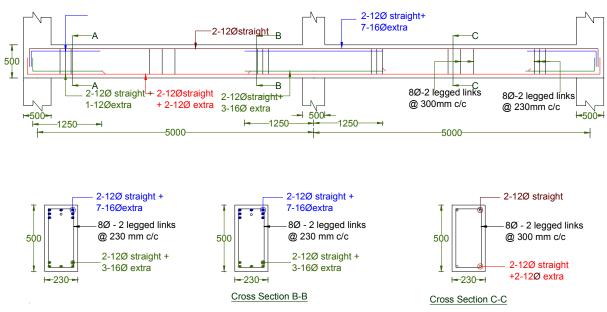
Reinforcement detail for the beam ABC as per IS 456:200 (with R=3.0)
